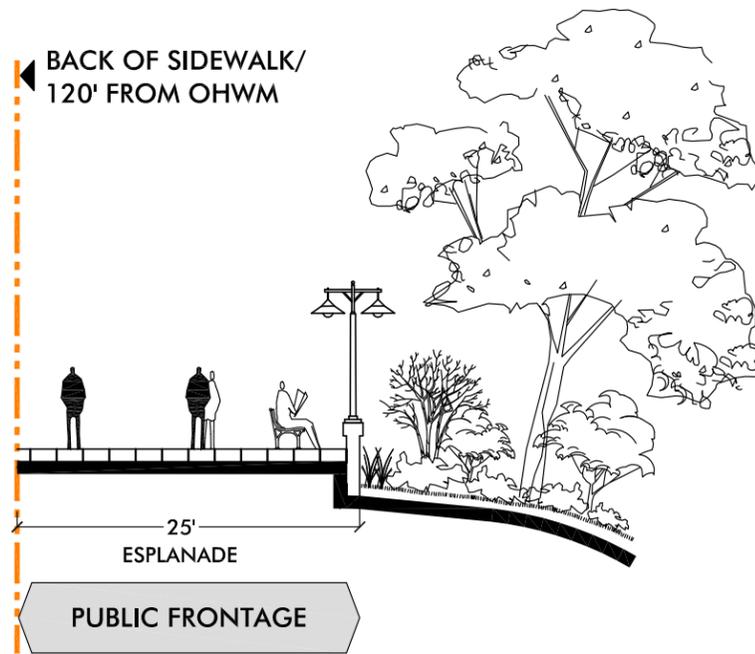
TUKWILA POND ESPLANADE SECTION
